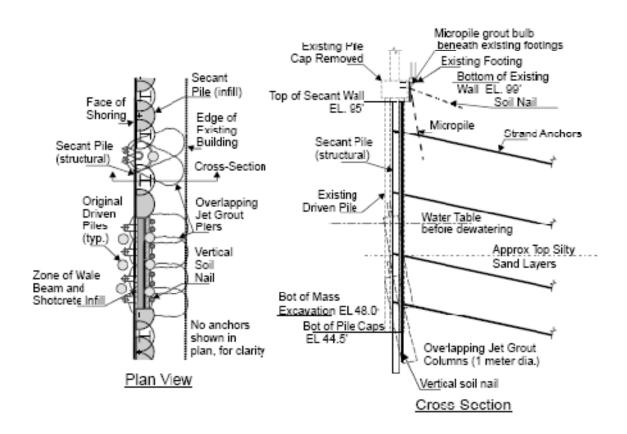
Typical Plan and Cross Section for Eagle Gate Tower Shoring
